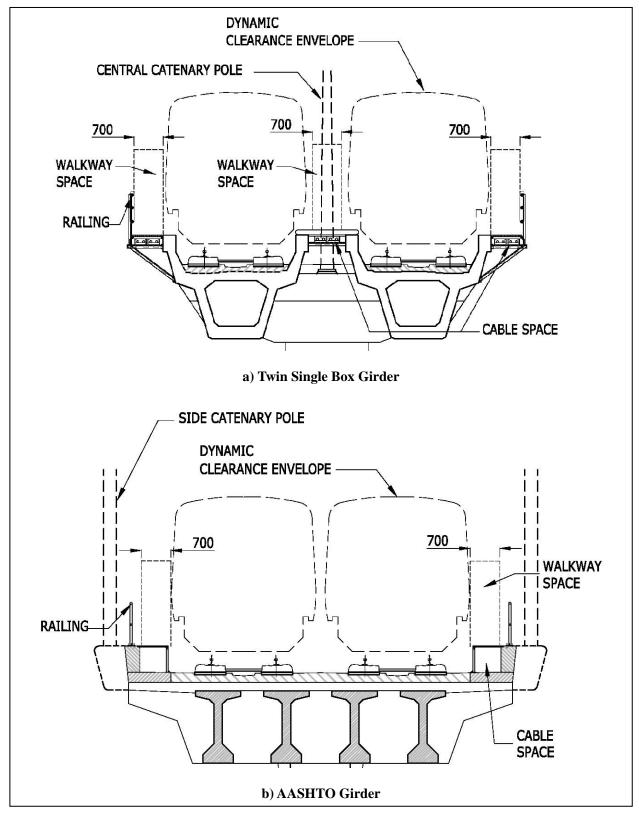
Viaduct Walkway and Railing Layouts
